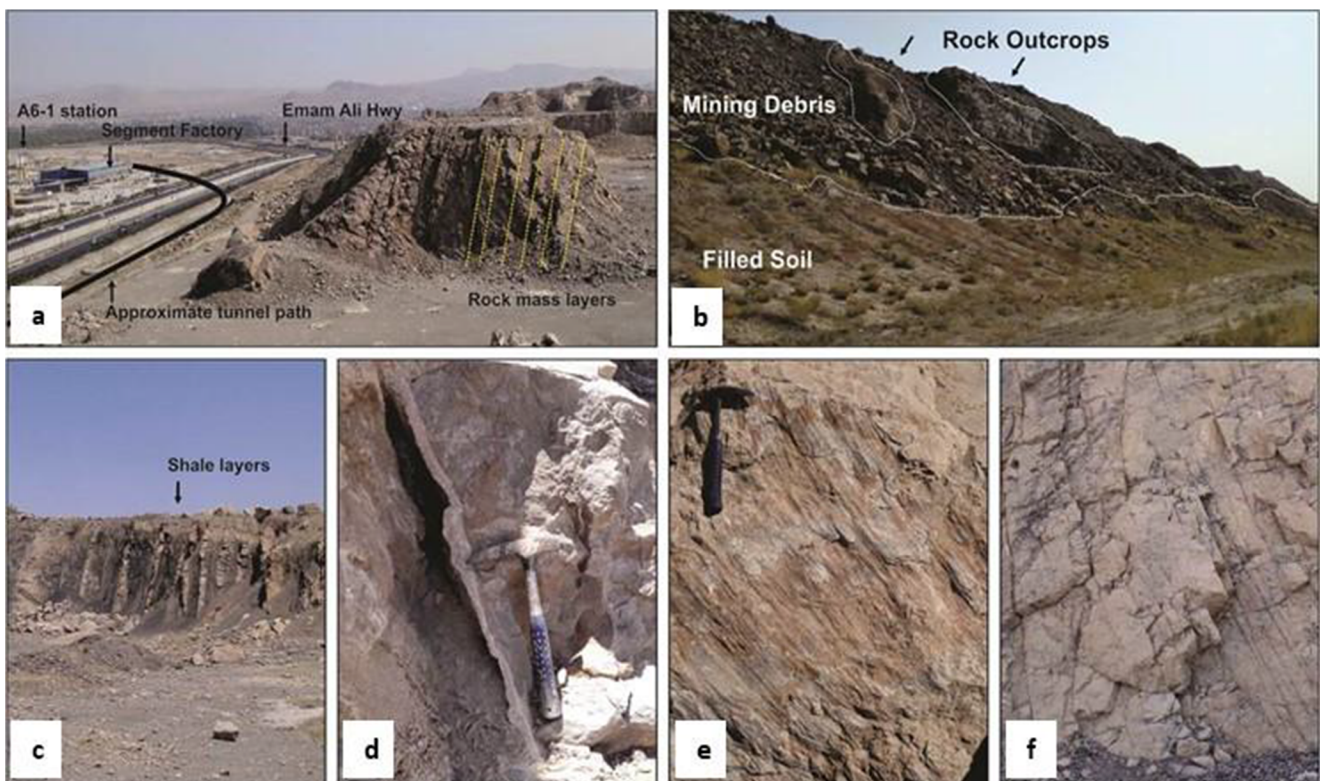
a Tunnel path and workshop from the mining site, b outcrops of rock covered by mining debris and filled soil, c alternation of shale and limestone layers, d joint with opening, e mirror fault, and f blocky rock (Rahsaz-Tarh Consulting Engineers 2016)
